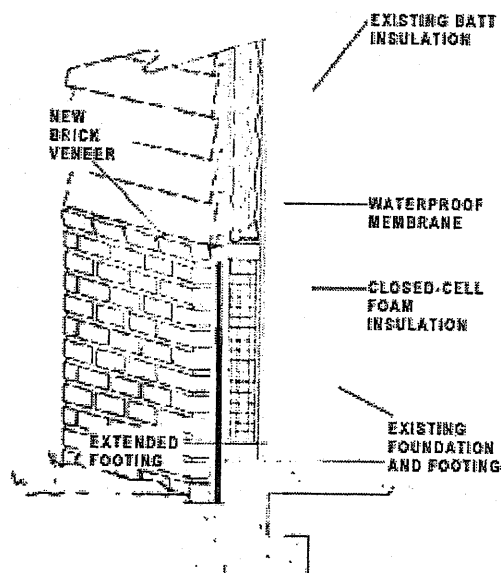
Adding Waterproof Veneer to Exterior Wall. FEMA 384, 1999
